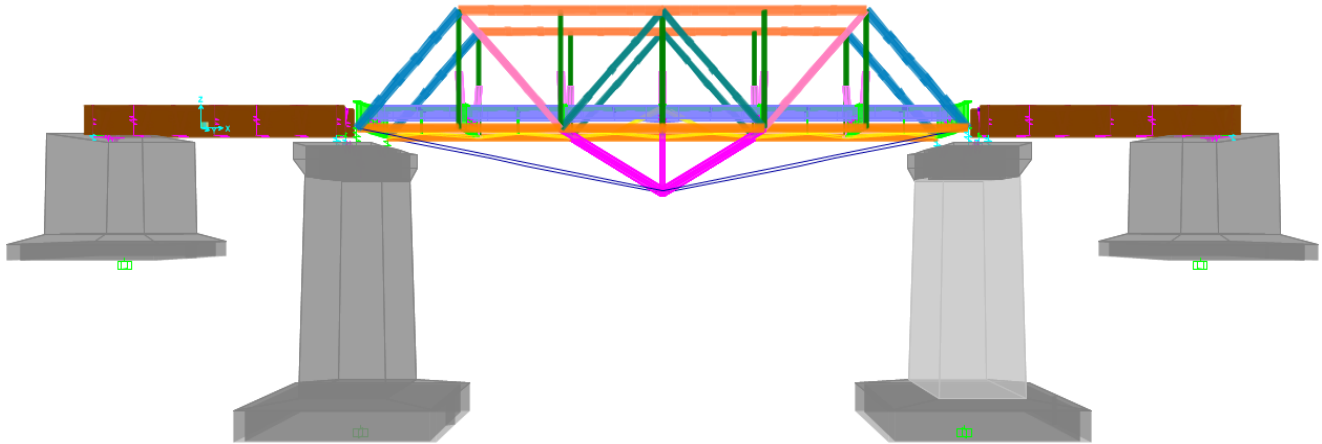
Side view of the external prestressing reinforcement model of the bridge structure
